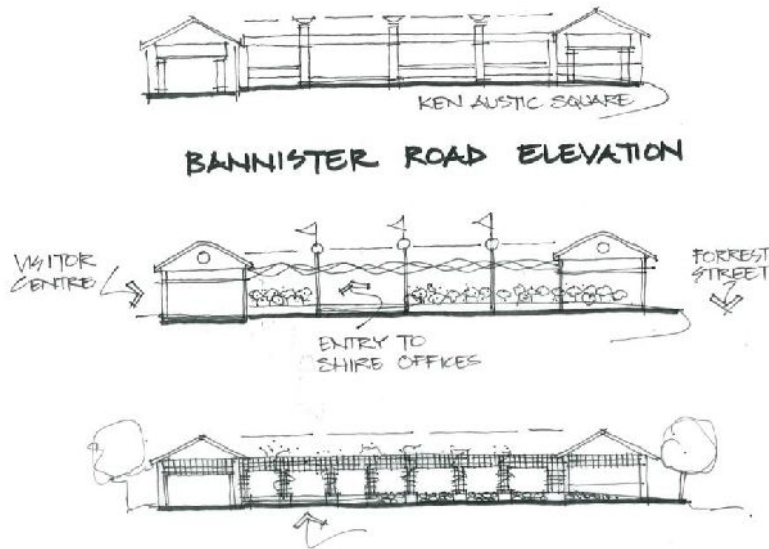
Section/ Elevation Proposal for Boddington Shire Offices
